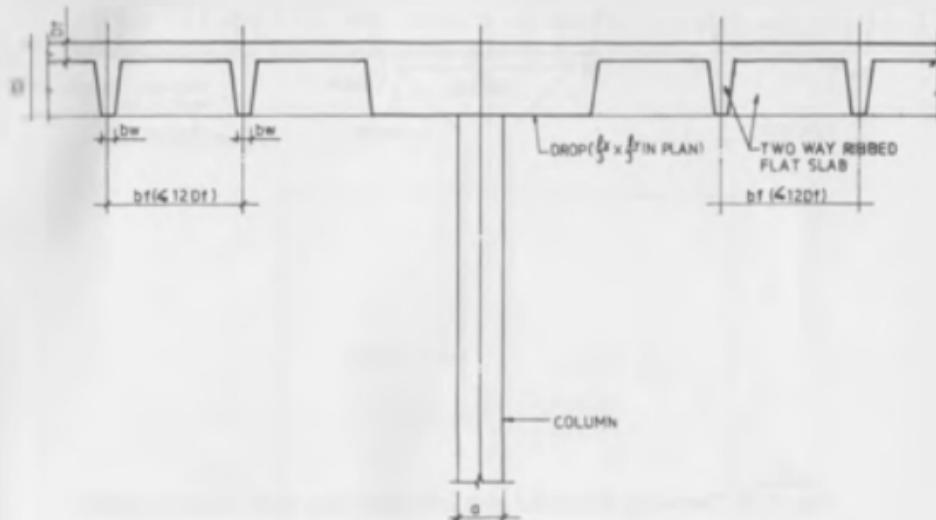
Two-way ribbed flat slab with solid drop (without column capital).
